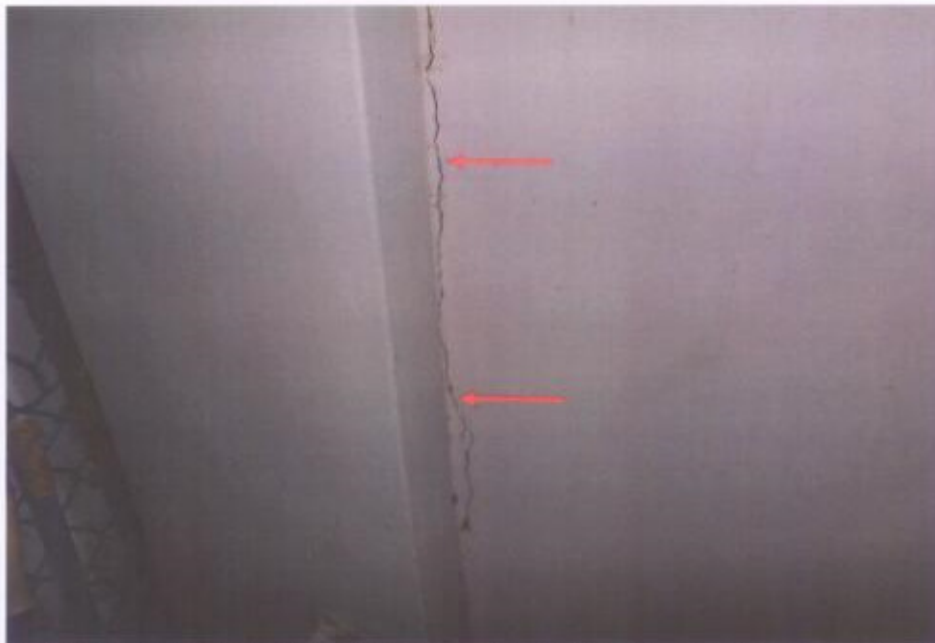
shows a section of the wall at the upper part separated into 2. This was on the interior side of the wall.
